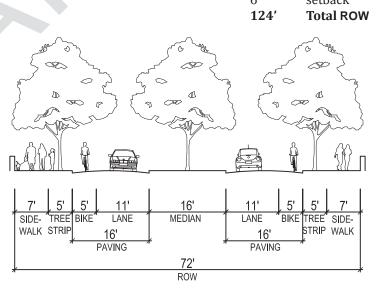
Street Type 8: Universe Boulevard Cross Section
